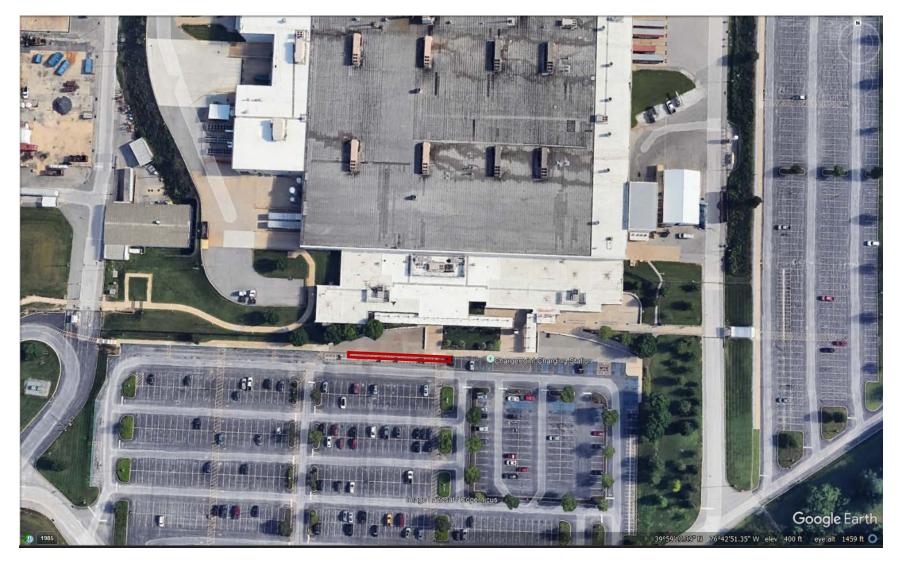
Stormwater inlet and pipe installation area shown in red rectangle.
